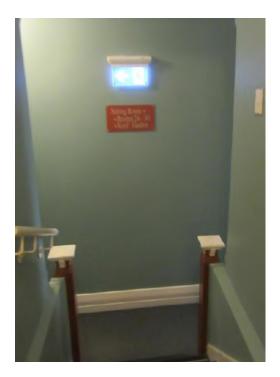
This opening from hallway 1.18 on the first floor of 139–141 George Street was created in the late 1980s to provide access into The Fortune of War Hotel. Source: TKD Architects 2020.
